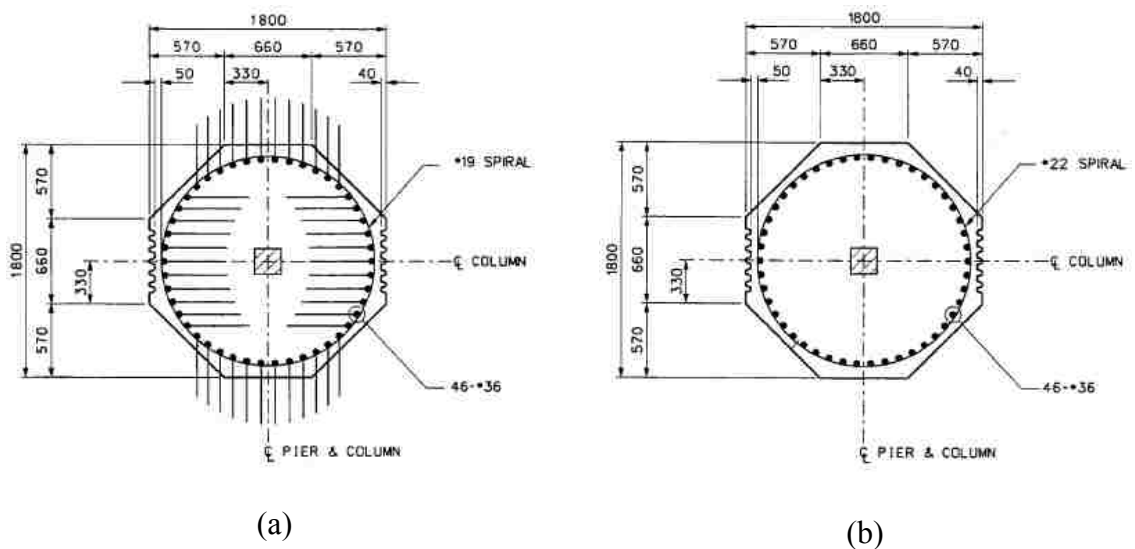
Bridge I-2139 - Bridge column sections at (a) pier 1 and (b) pier 2
